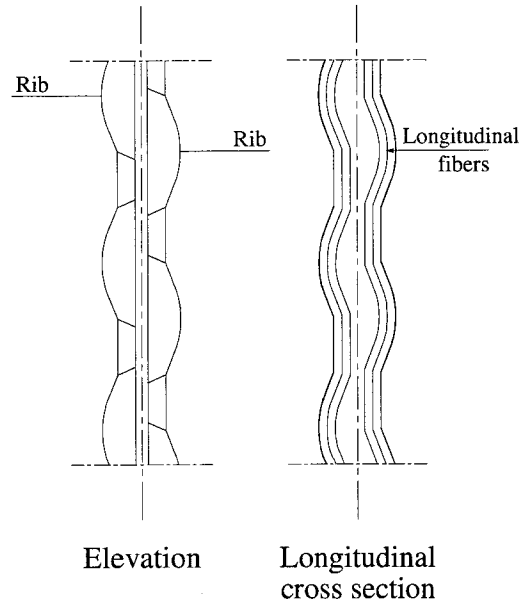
Schematic elevation and longitudinal cross section of the rebar
